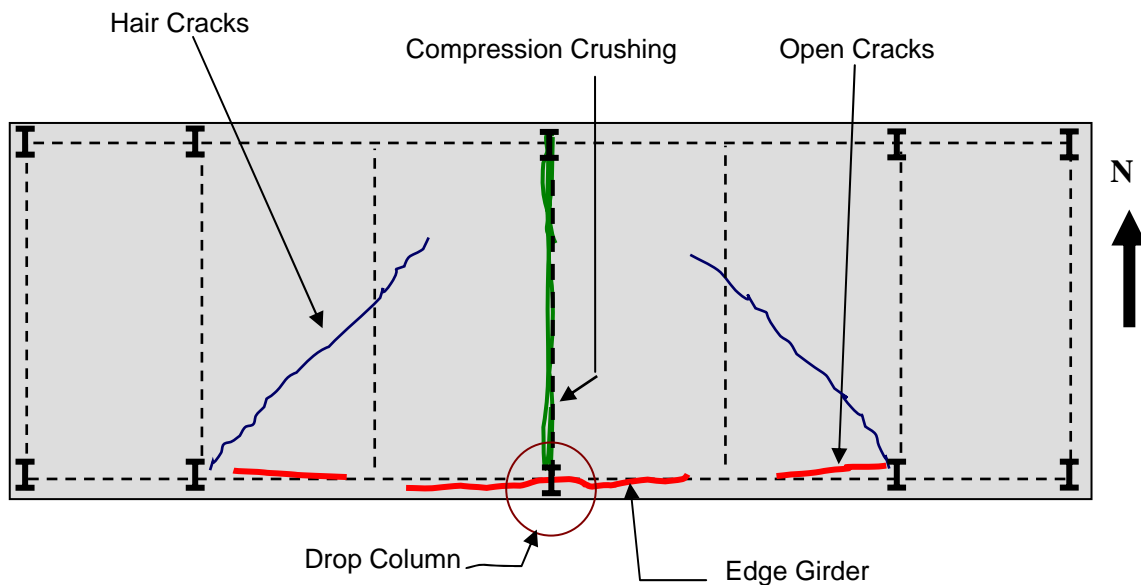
Crack Pattern on the Floor Slab at the End of Test AISC-3
